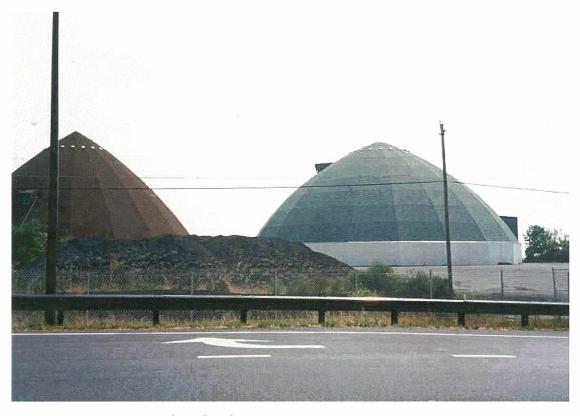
SHA Salt Storage Domes, MD Rte. 121 at I-270
